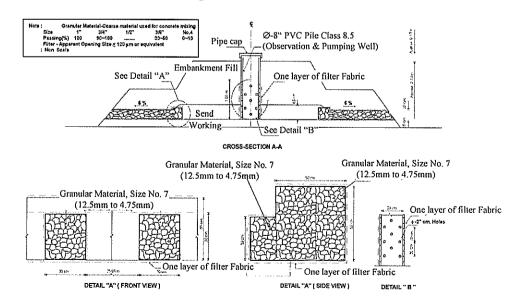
Typical Cross - Section of additional trenches and pumping wells in BCNH
